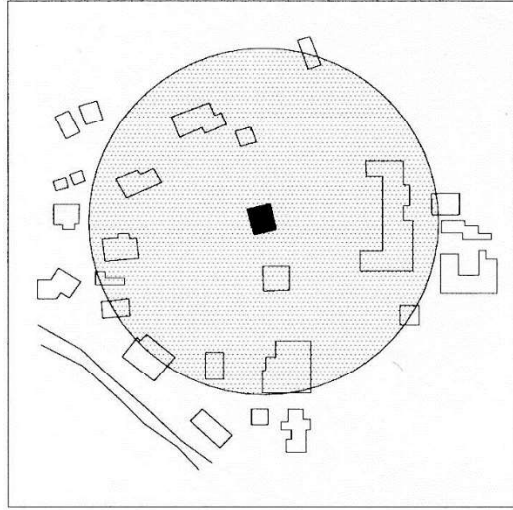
Interior Lot with No Street Frontage
